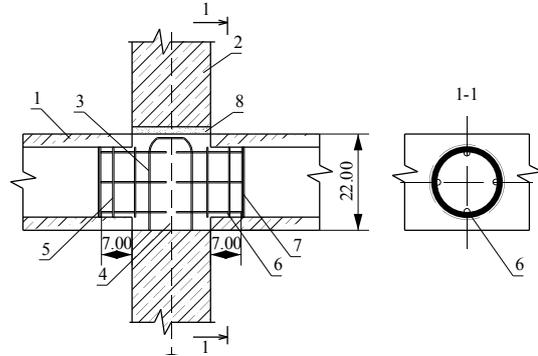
Contact-platform joint of panel walls with hollow-plate support zones brought beyond the wall area: 1 – hollow-core slab; 2 – wall panel; 3 – stub bars from the wall panel; 4 – grouting concrete; 5 – key; 6 – key reinforcement cage; 7 – key size limiter; 8 – cement-sand mortar
